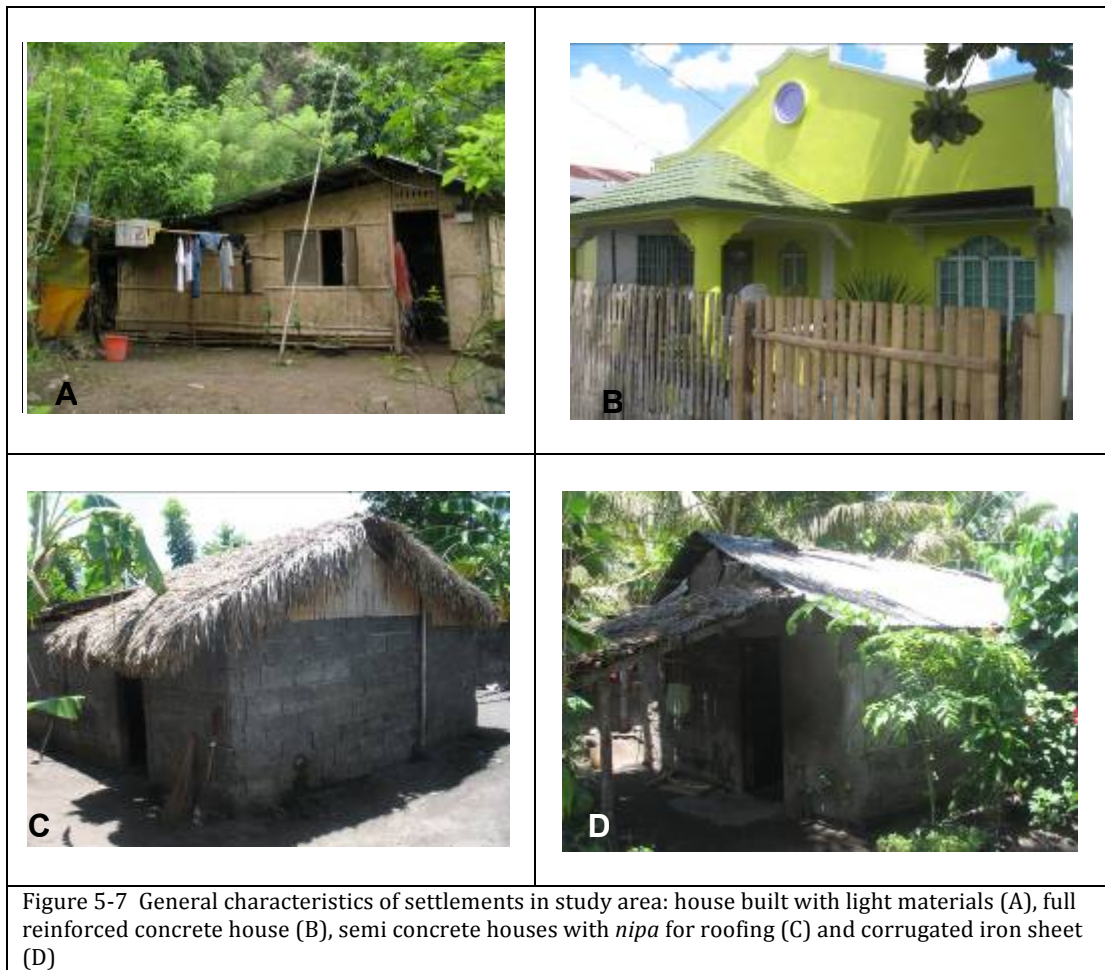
General characteristics of settlements in study area: house built with light materials (A), full reinforced concrete house (B), semi concrete houses with *nipa* for roofing (C) and corrugated iron sheet (D)
